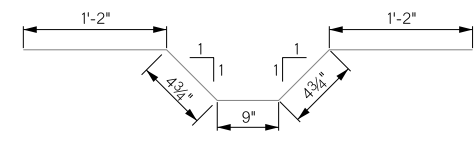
DETAIL OF DECK REPAIR AT CONSTRUCTION JOINT
